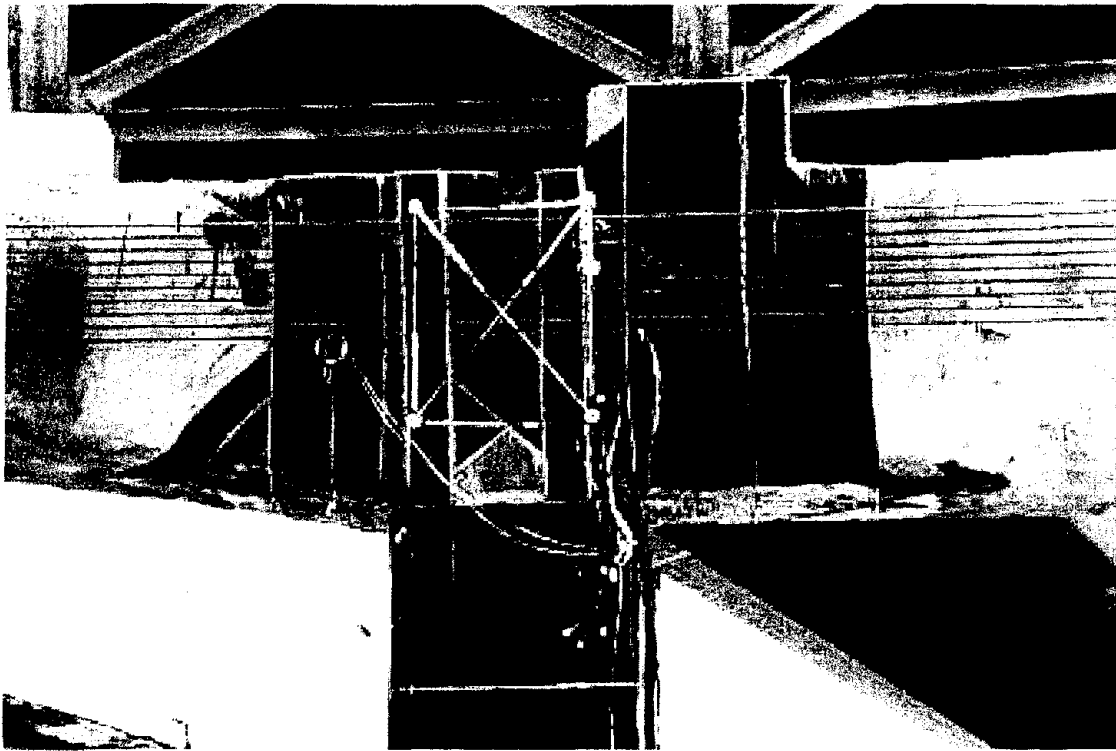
Detail of LVDT's and FRP composite on exterior beam cap-column joint
